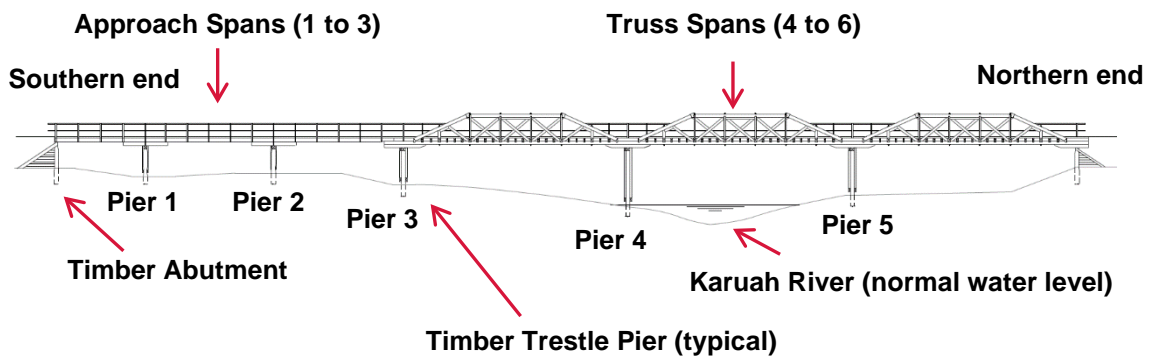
Diagram showing general arrangement of Monkerai Bridge.
